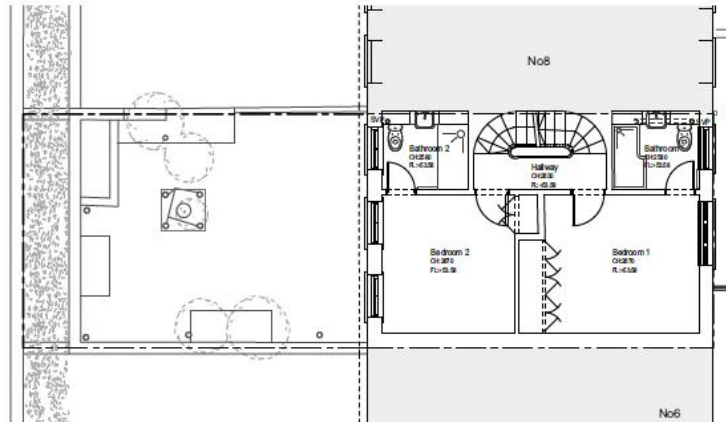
EXISTING SECOND FLOOR PLAN
